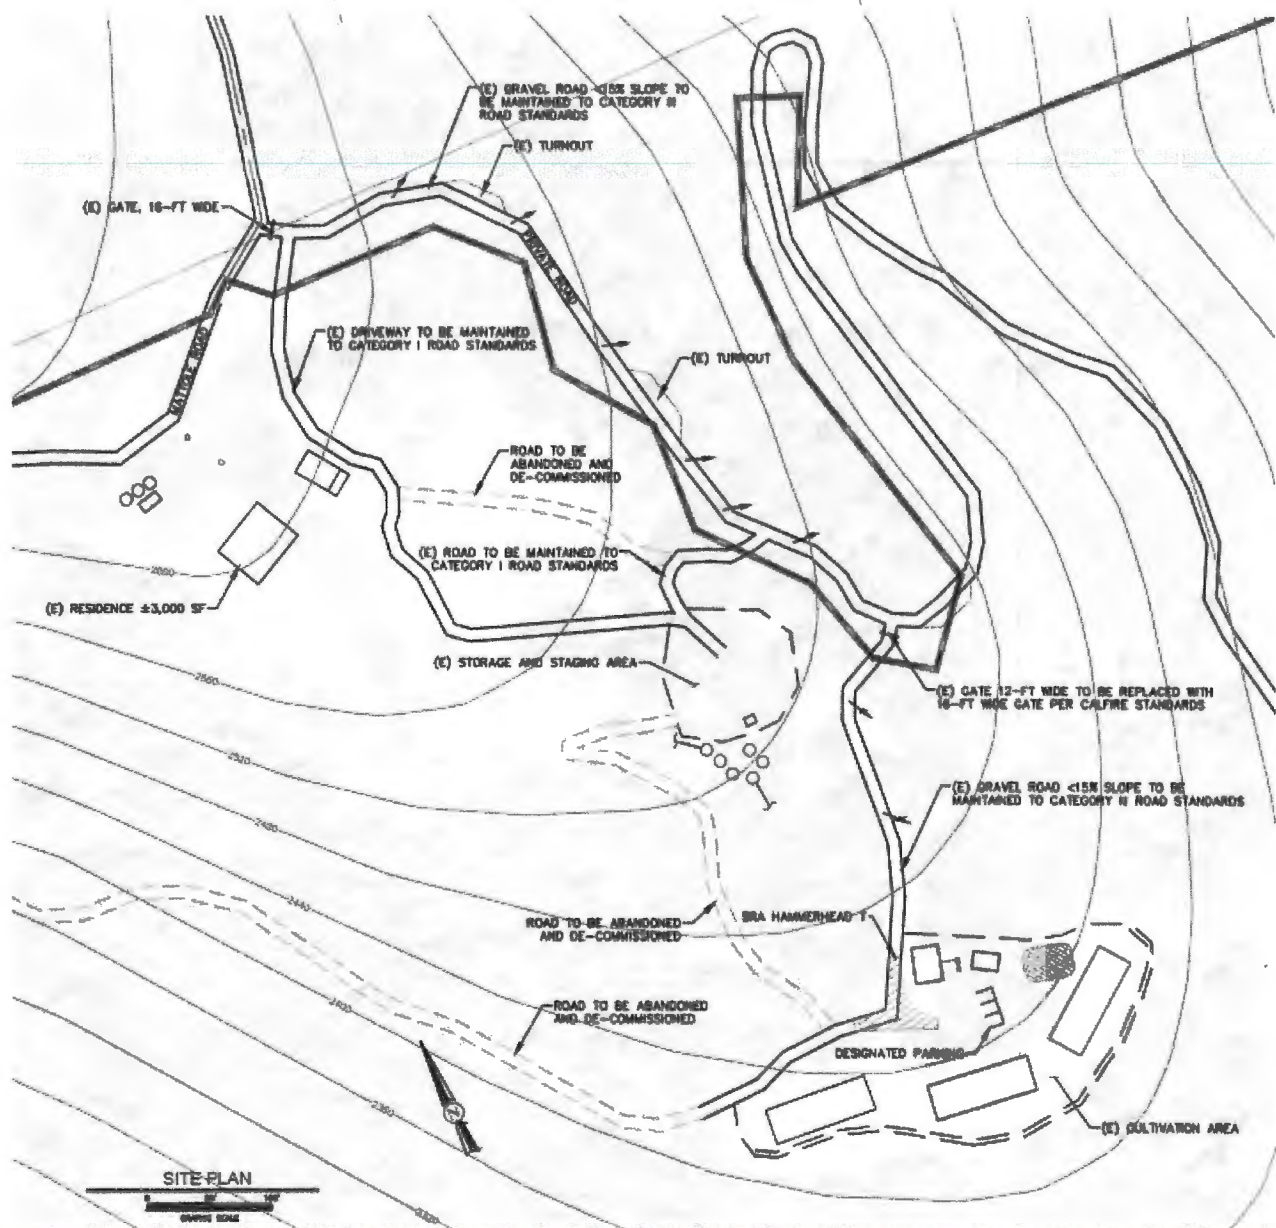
Good Fields Agro road overview indicating road segments, SRA features, existing use areas, and direction of road surface runoff.
